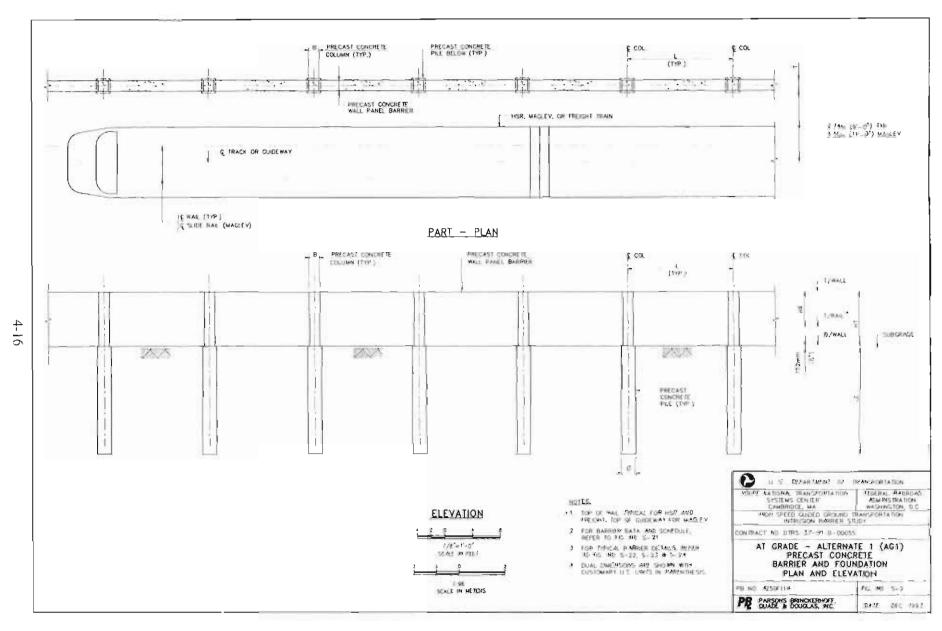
AT GRADE ALTERNATE 1: PRECAST CONCRETE (P/C) WALL AND P/C FOUNDATION - PLAN AND ELEVATION
